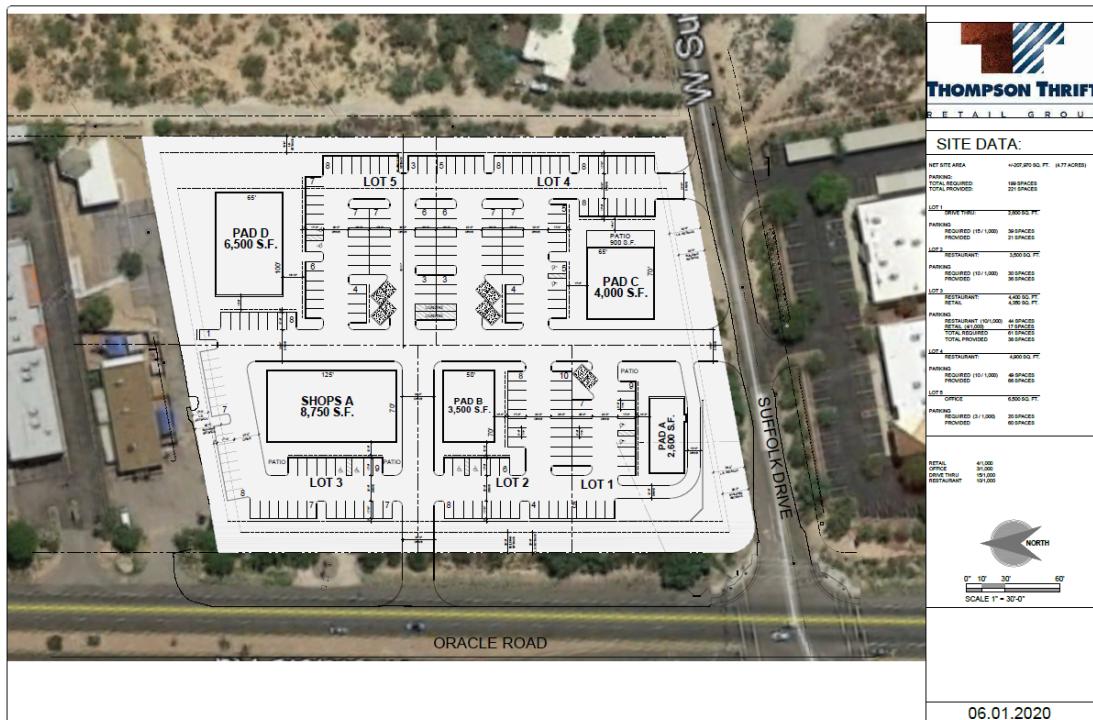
Site Plan for Vacant/New Development Portion of Rezoning
